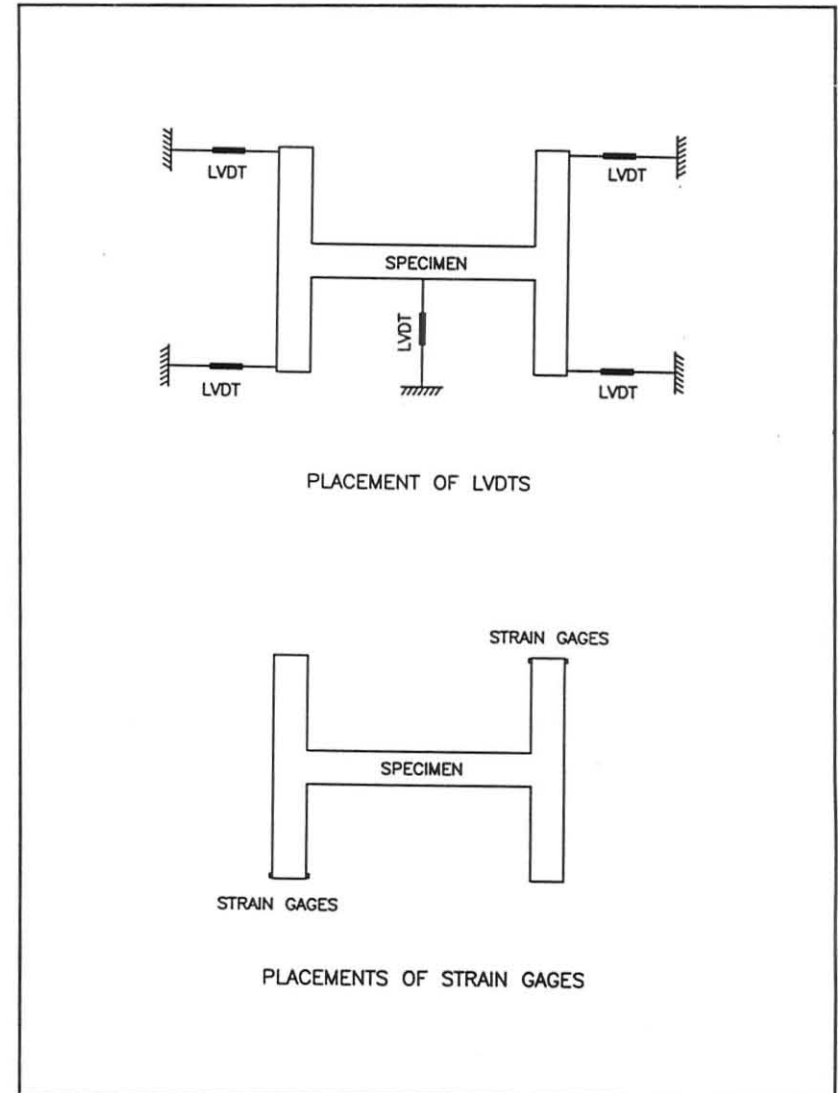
Arrangements of Strain gages and LVDTs at Mid-Height of a Specimen
